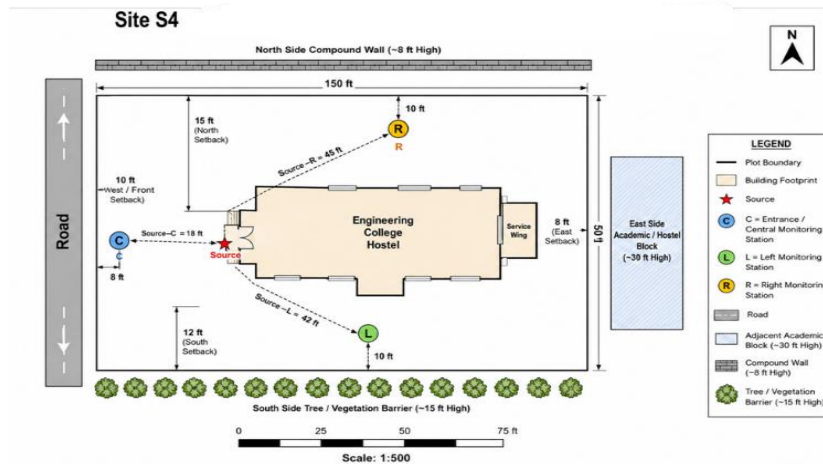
Instrument layout at site S4 ENGG COLLEGE hostel campus
